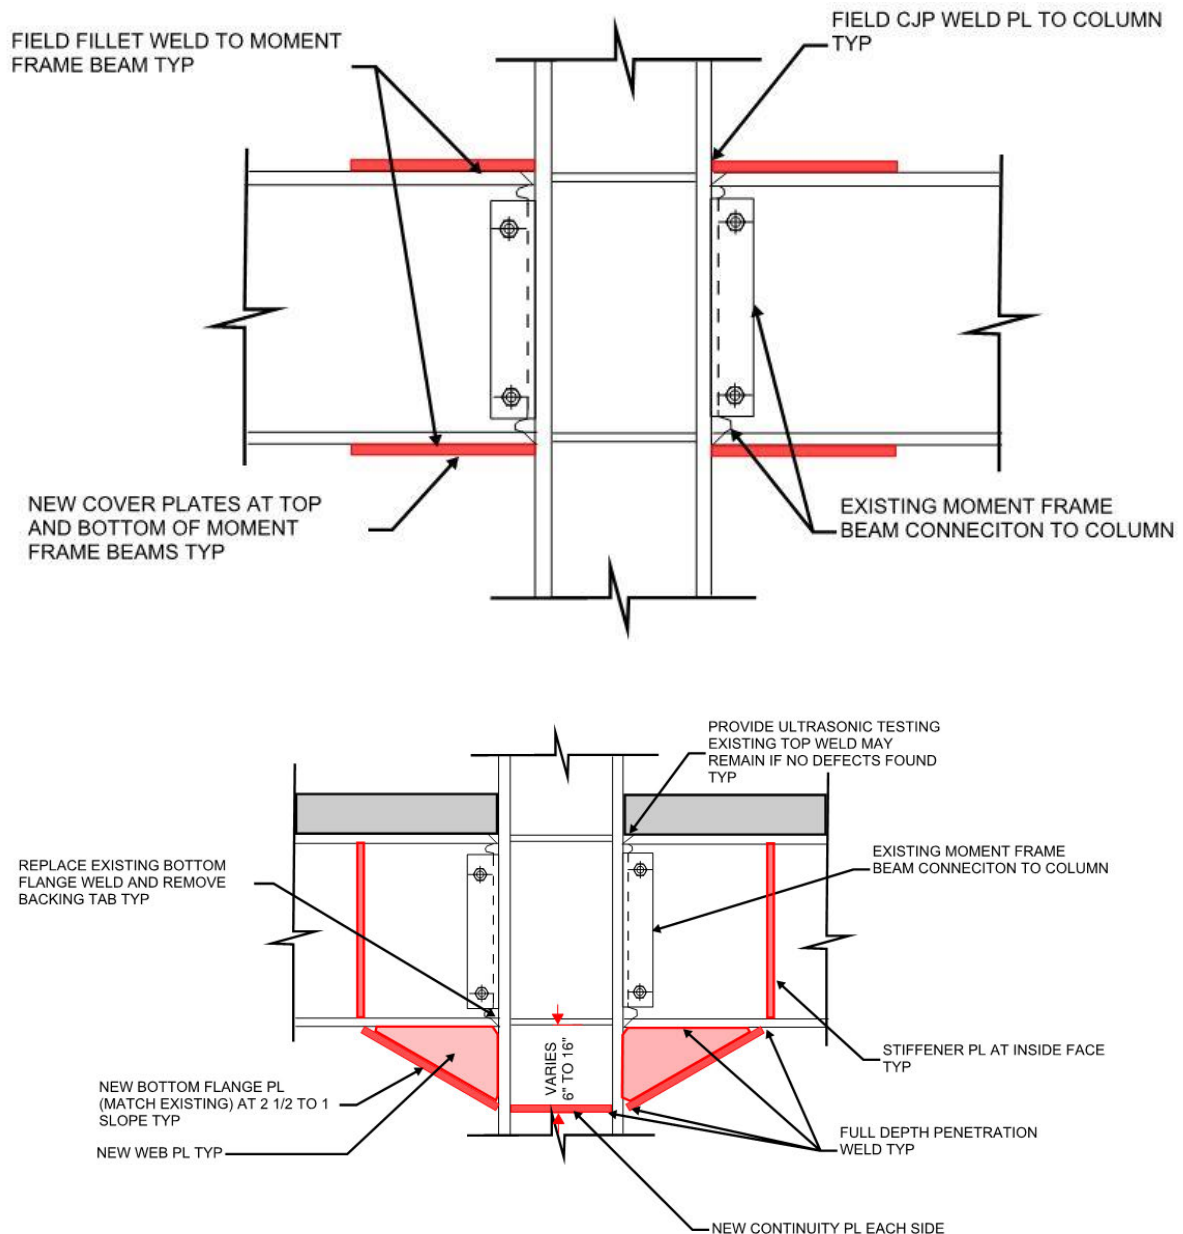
Moment Frame Beam to Column Connection Reinforcement
